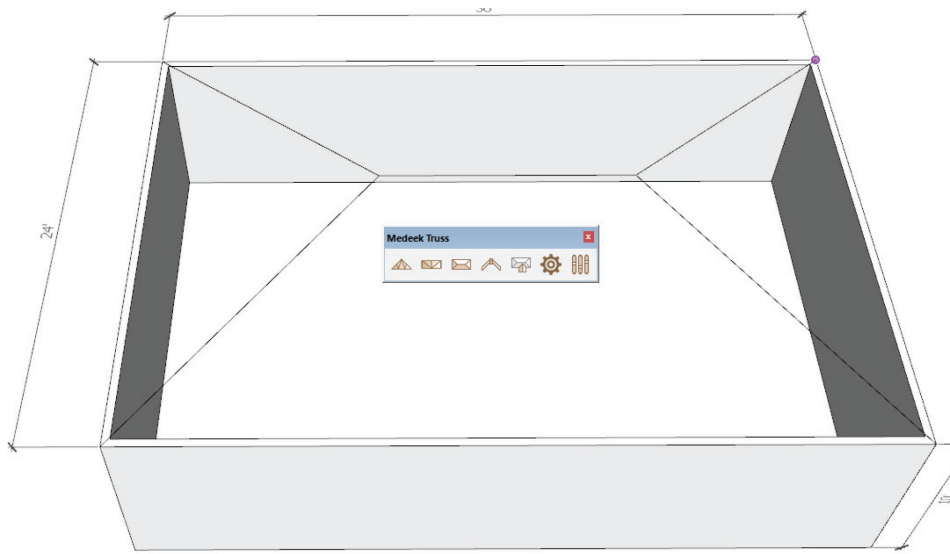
Generate Roof Using Medeek Roof Extension.
